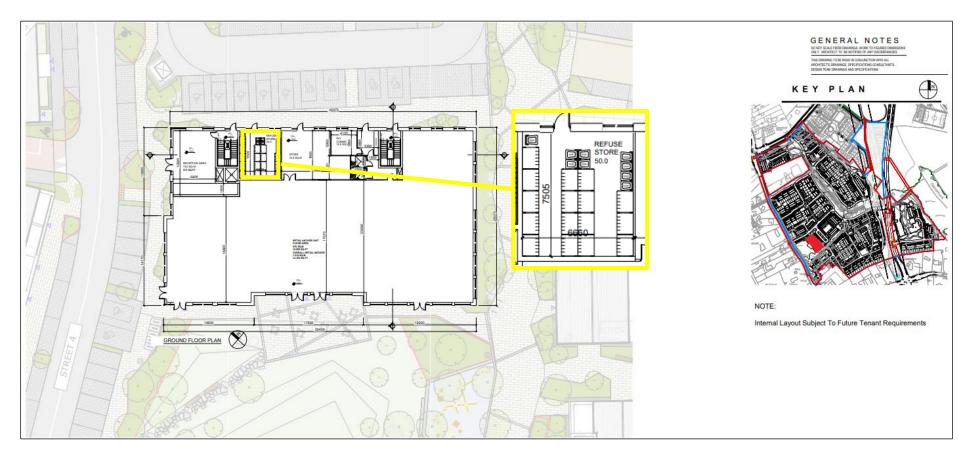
Layout of Neighbourhood Centre Block Internal Waste Storage Area
